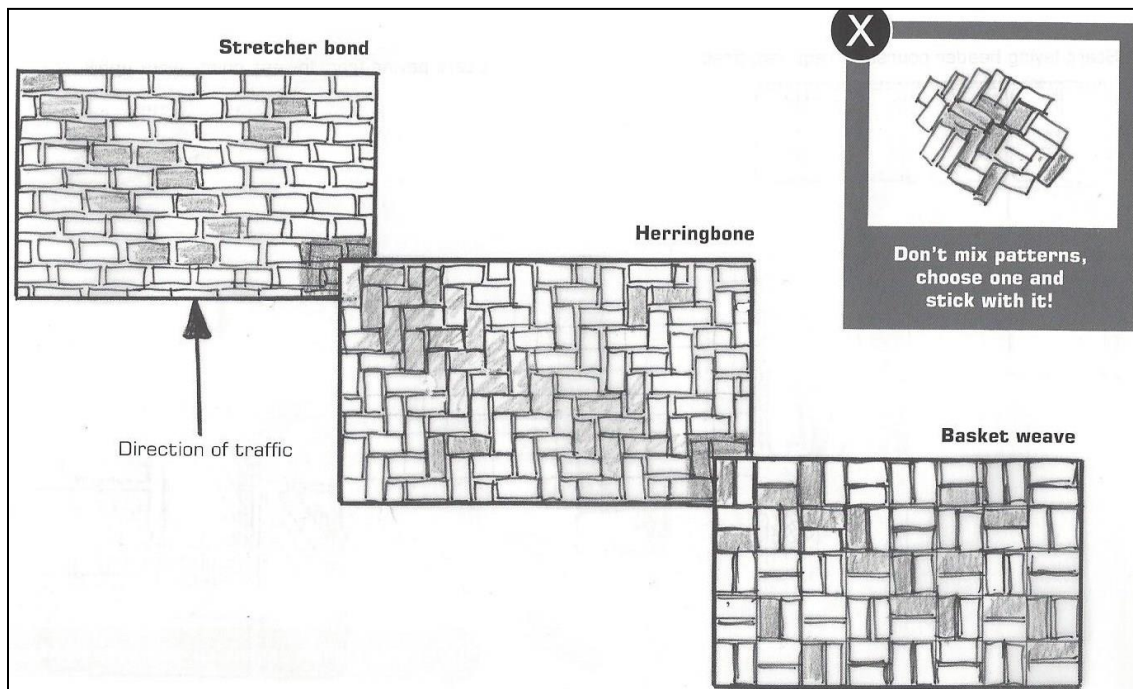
An example of different concrete brick laying patterns for a simple interlocking concrete brick (Cairns, N.D.).
